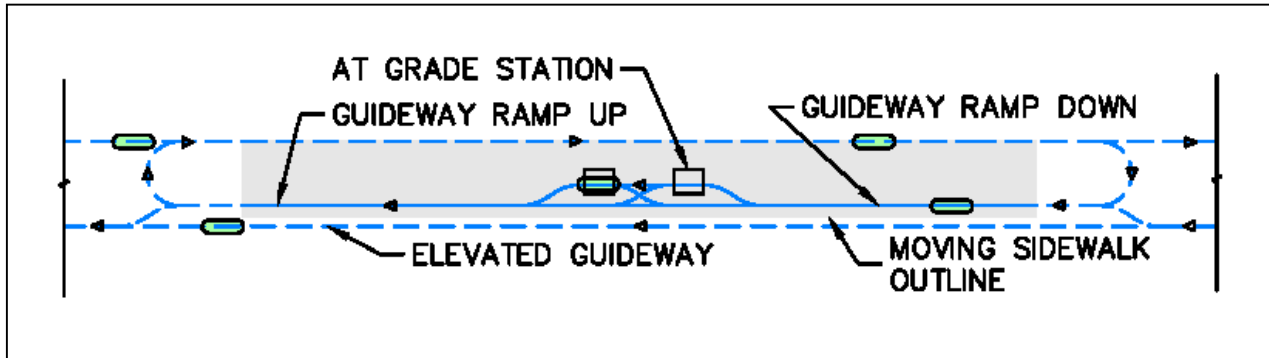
PRT station layout. This layout demonstrates how a two-bay station and its associated up- and down-ramps occupies less space than a typical double moving sidewalk (24 feet by 200feet).
